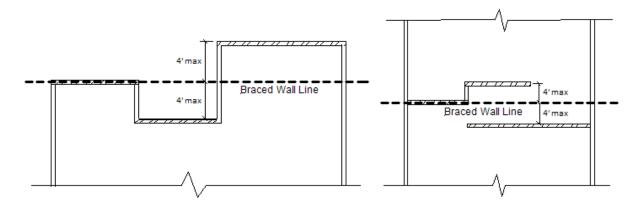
Examples of Braced Wall Lines With Compliant Offsets
